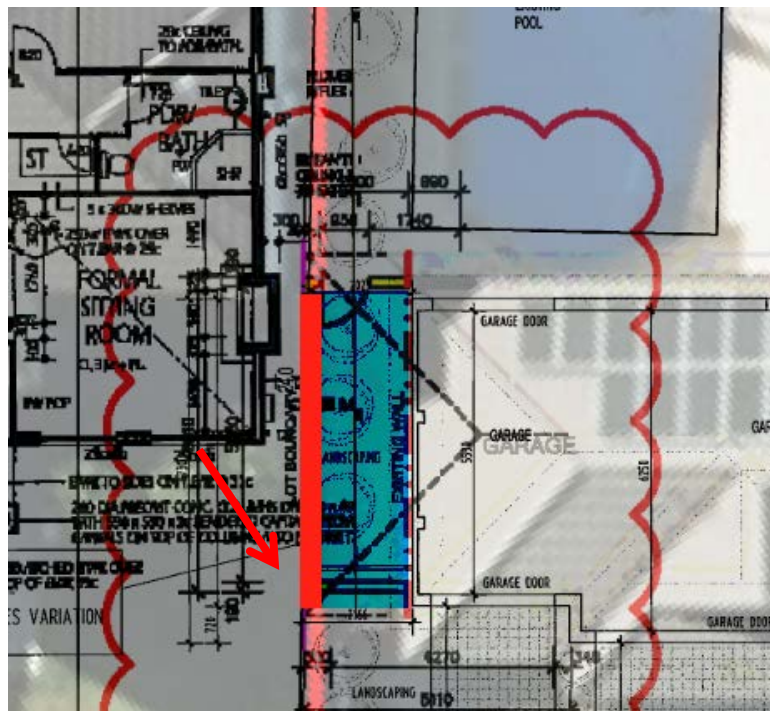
Site plan overlay of the subject application and the neighbouring properties ground floors. The rectangle highlighted in blue displays the area being extended, the red line demonstrates the parapet wall and the arrow demonstrates the oblique view of the proposed wall from the neighbour's sitting room.
